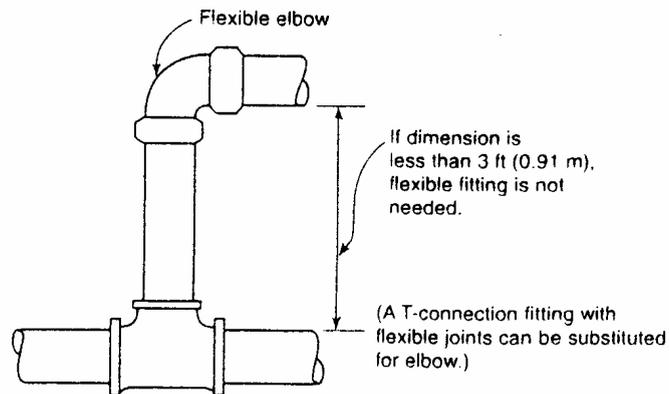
(2) Flexible coupling on main riser and branch line riser.
